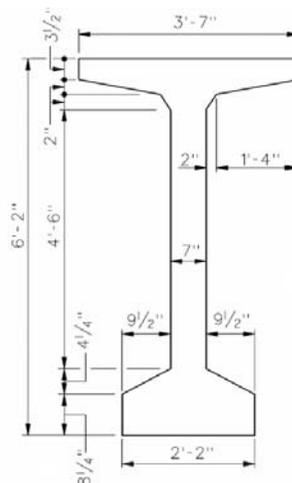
Dimensions of 74-in. Deep Modified Bulb-Tee Girder Section
